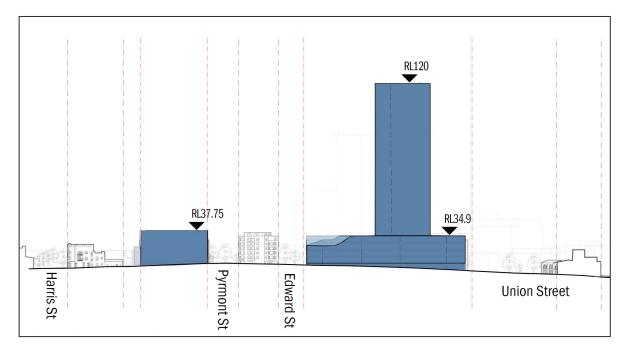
Building envelope section: Pyrmont Bridge Road (showing both Metro sites) (Hassell)
